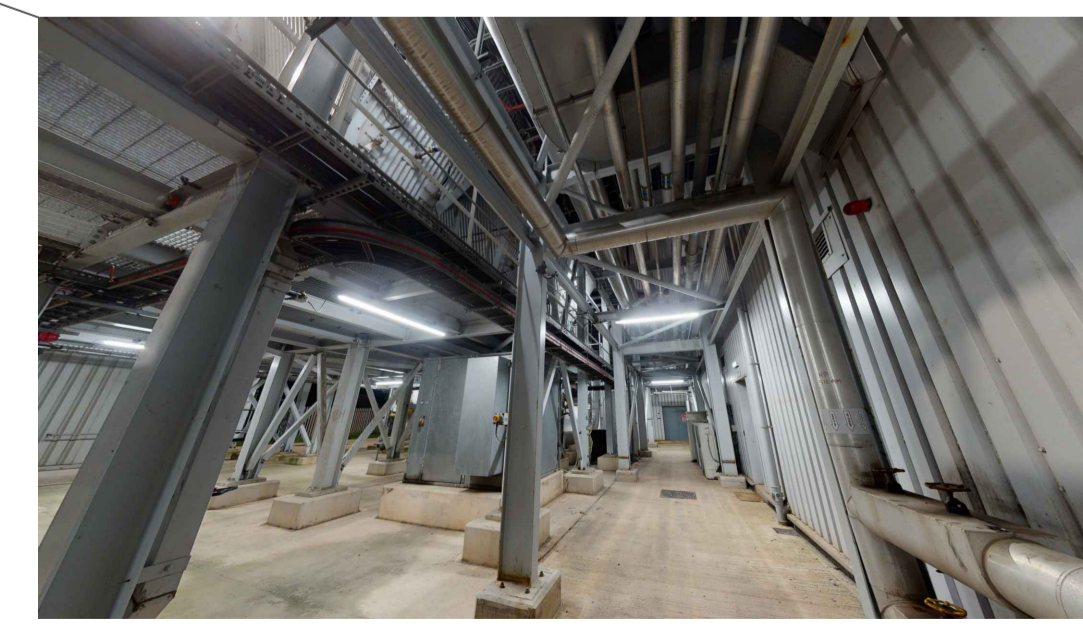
showing external batten luminaires at ground floor bagging area not shown on plan due to obscuration by structure/machinery
